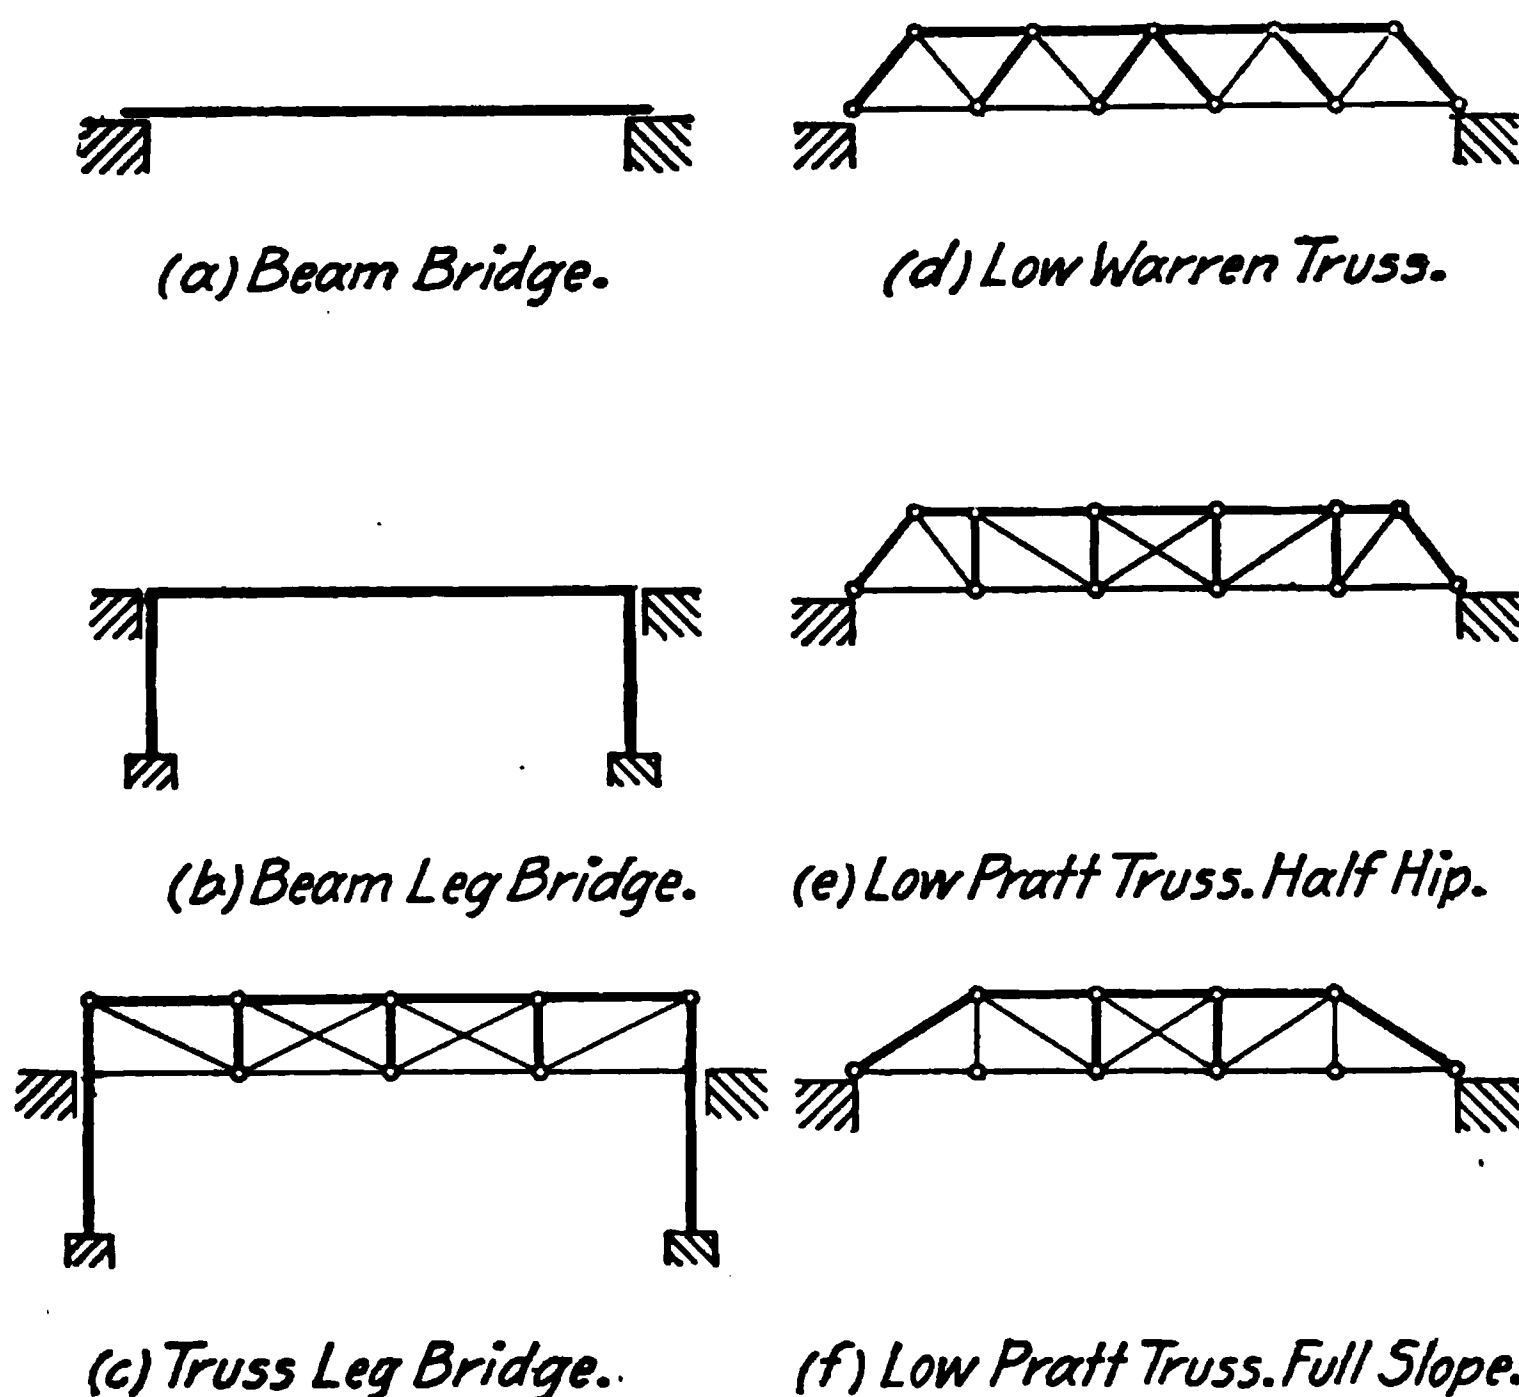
TYPES OF SHORT SPAN HIGHWAY BRIDGES.
